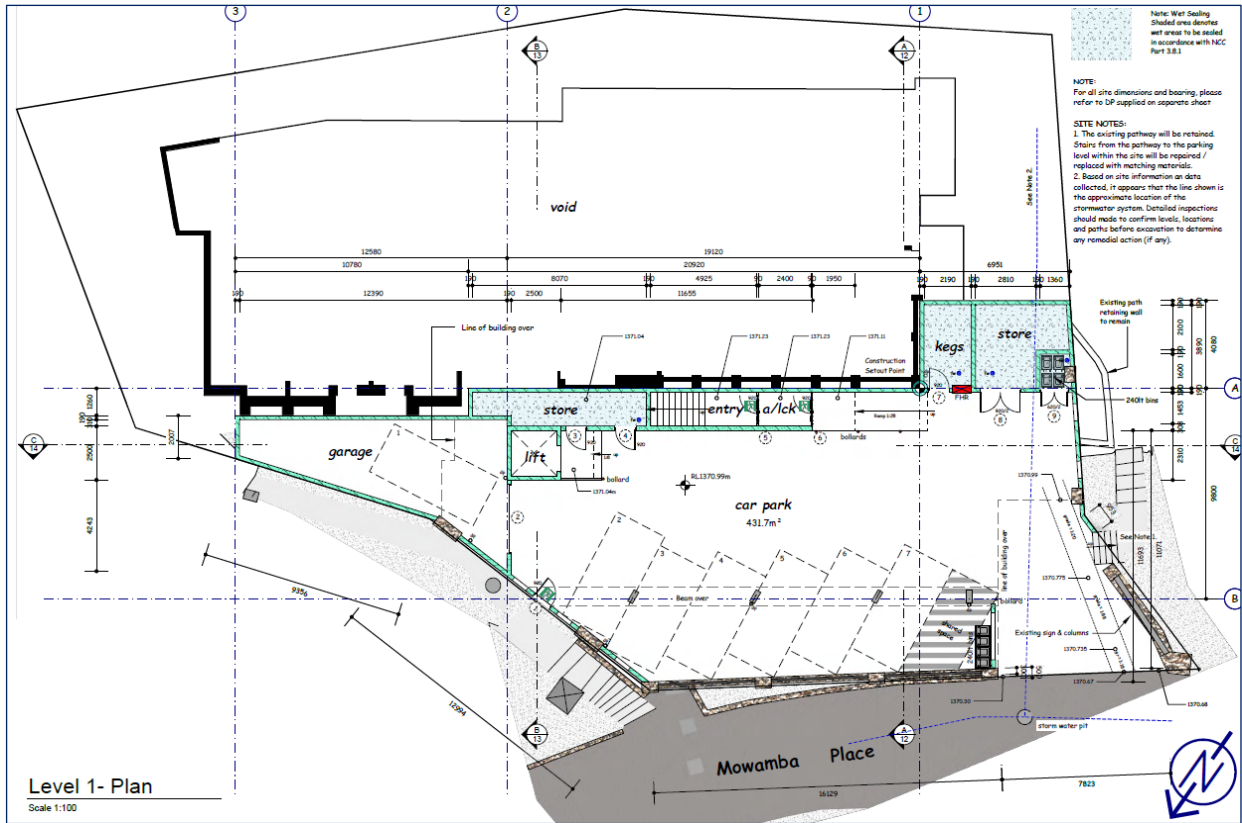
| Level 1 car parking works and new entrance area (Source: Applicant's documentation)
